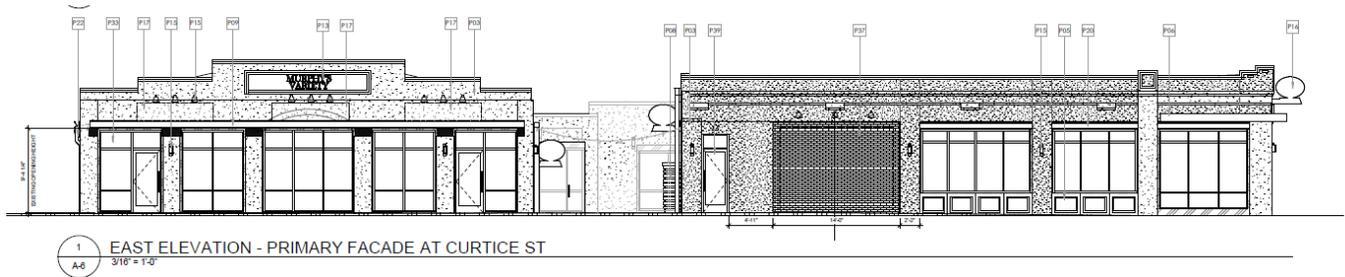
Proposed elevation, Curtice St. side of 2600 W. Main St.
